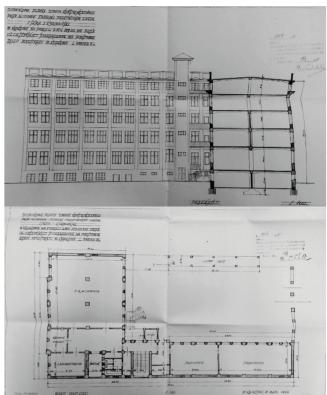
Sample technical drawings from the archival documentation of the factory building, Cracow, May 1924 [5]
